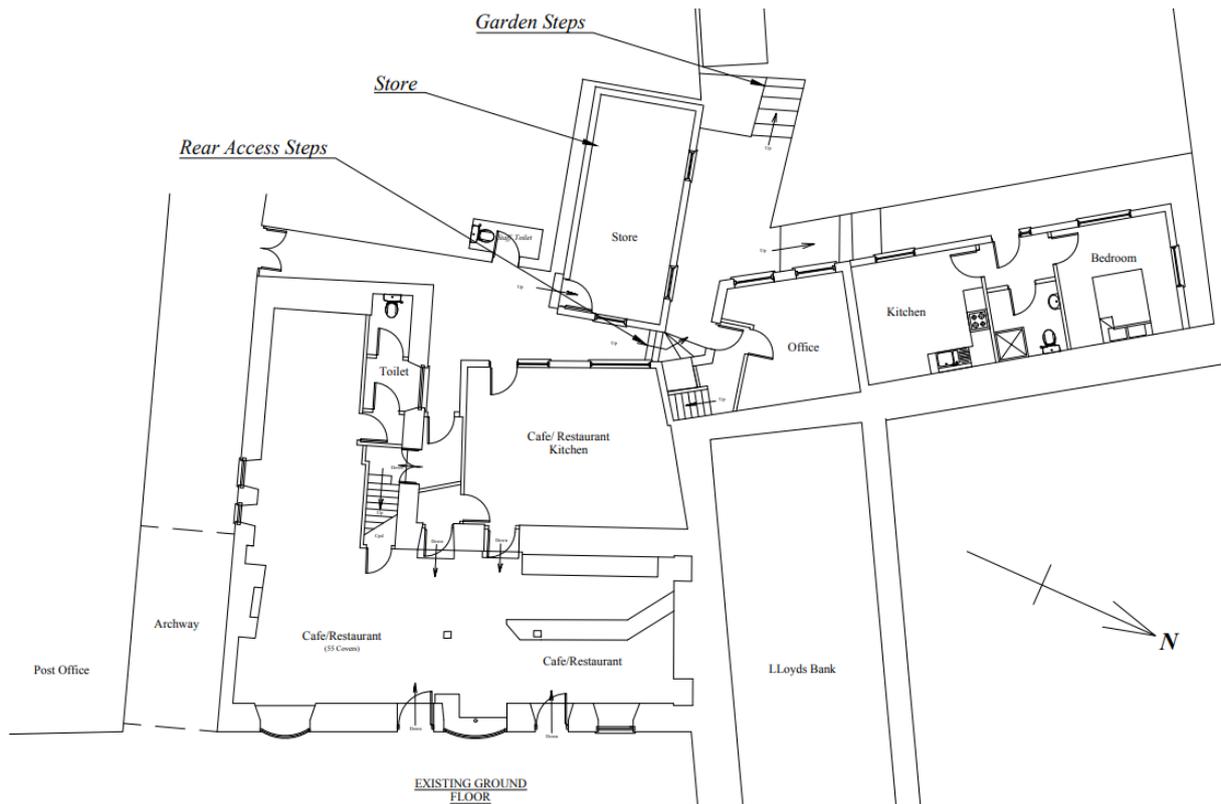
Existing ground-floor plan of Kavorna (approximate scale 1:100) (P. Osborne).
